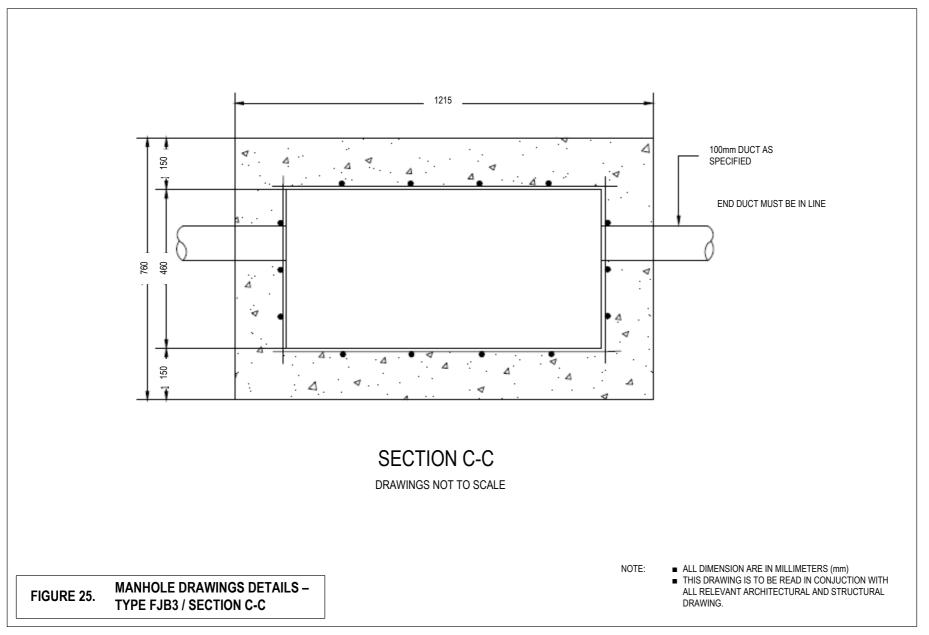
Manhole drawings details - Type FJB3 / section C-C
